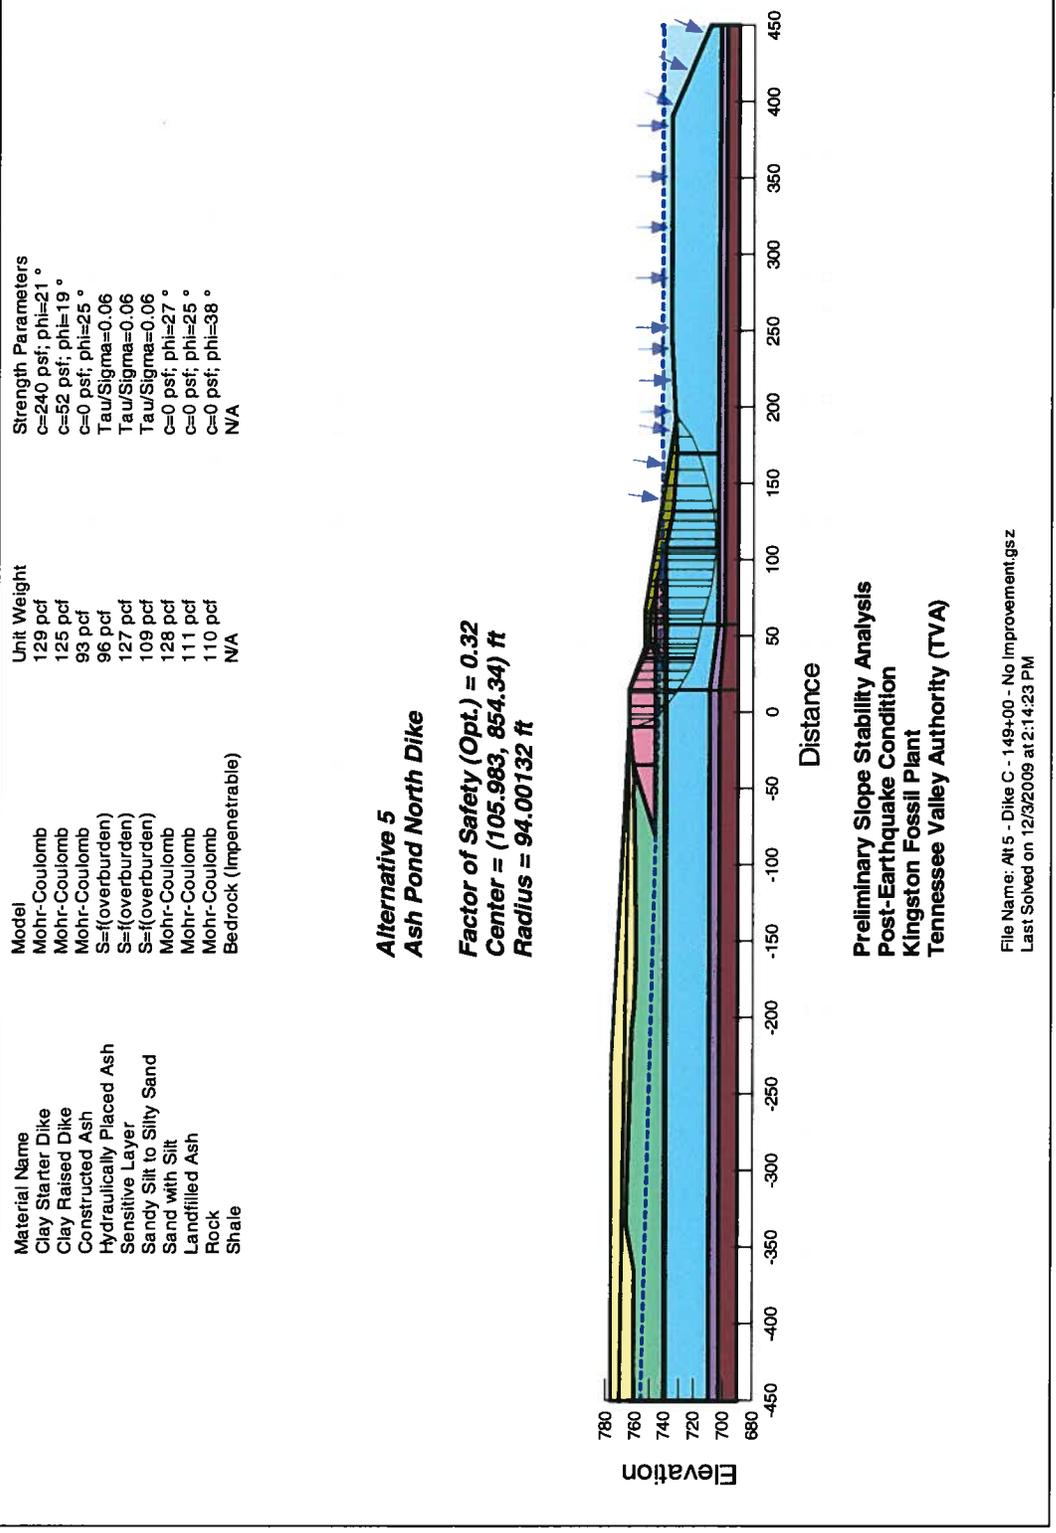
Alternative 5, Ash Pond South Dike C, Without Improvement
